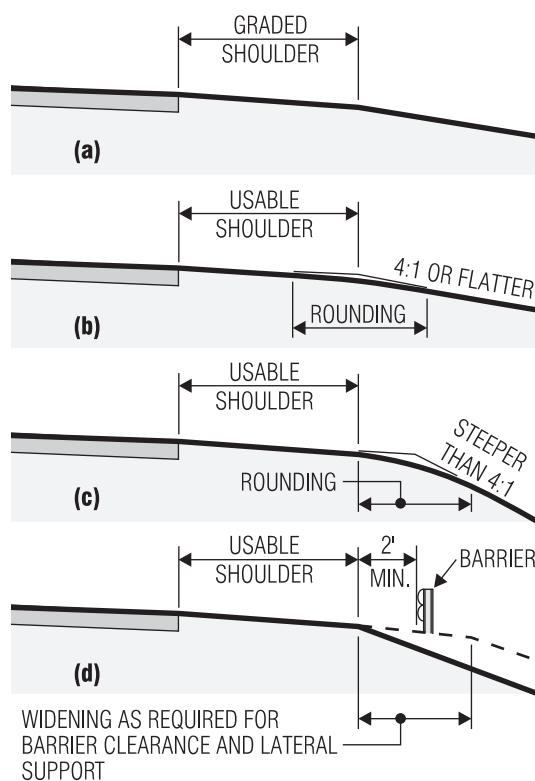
Cross section of a highway with shoulders. (a) Graded shoulder. (b) Shoulder with side slope of 4:1 or less. (c) Shoulder with side slope exceeding 4:1. (d) Shoulder wide enough to permit installation of a guard rail, wall, or other barrier. Such vertical elements should be offset at least 2 ft from the outer edge of the usable pavement.
